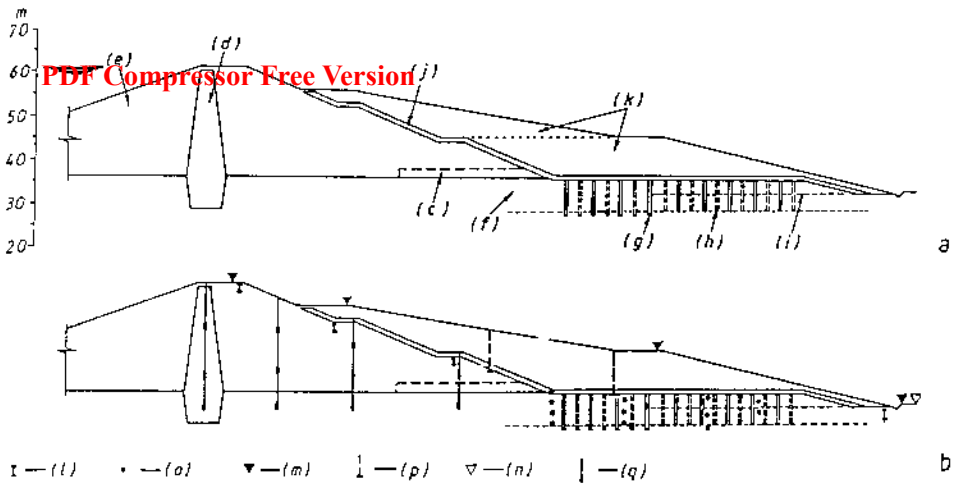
Monitoring for Prospect earthfill dam (ICOLD 1989). a) Cross section showing old dam and fill buttressing. b) Cross section showing monitoring systems. c) Rubble filled drainage tunnel. d) Puddle clay core. e) Clay shoulders. f) Alluvial clay foundation. g) Filter drainage cutoff trench along downstream foundation extending to rock. h) Vertical sand drains. i) Lateral drains. j) Filter zone. k) Stabilizing fill material (shale) constructed in two stages. l) Inclinometers. m) Surface settlement points. n) Seepage collection and measurement. o) Pneumatic and electric piezometers. p) Foundation settlement installations. q) Open standpipe piezometers.
